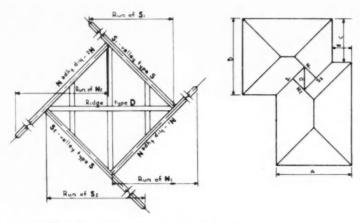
Detailed sketches of roof type H6 in Fig. 1. Length of ridge and members created at intersection of two hip roofs within the perimeter of roof framing can be determined through use of the formulae given below
